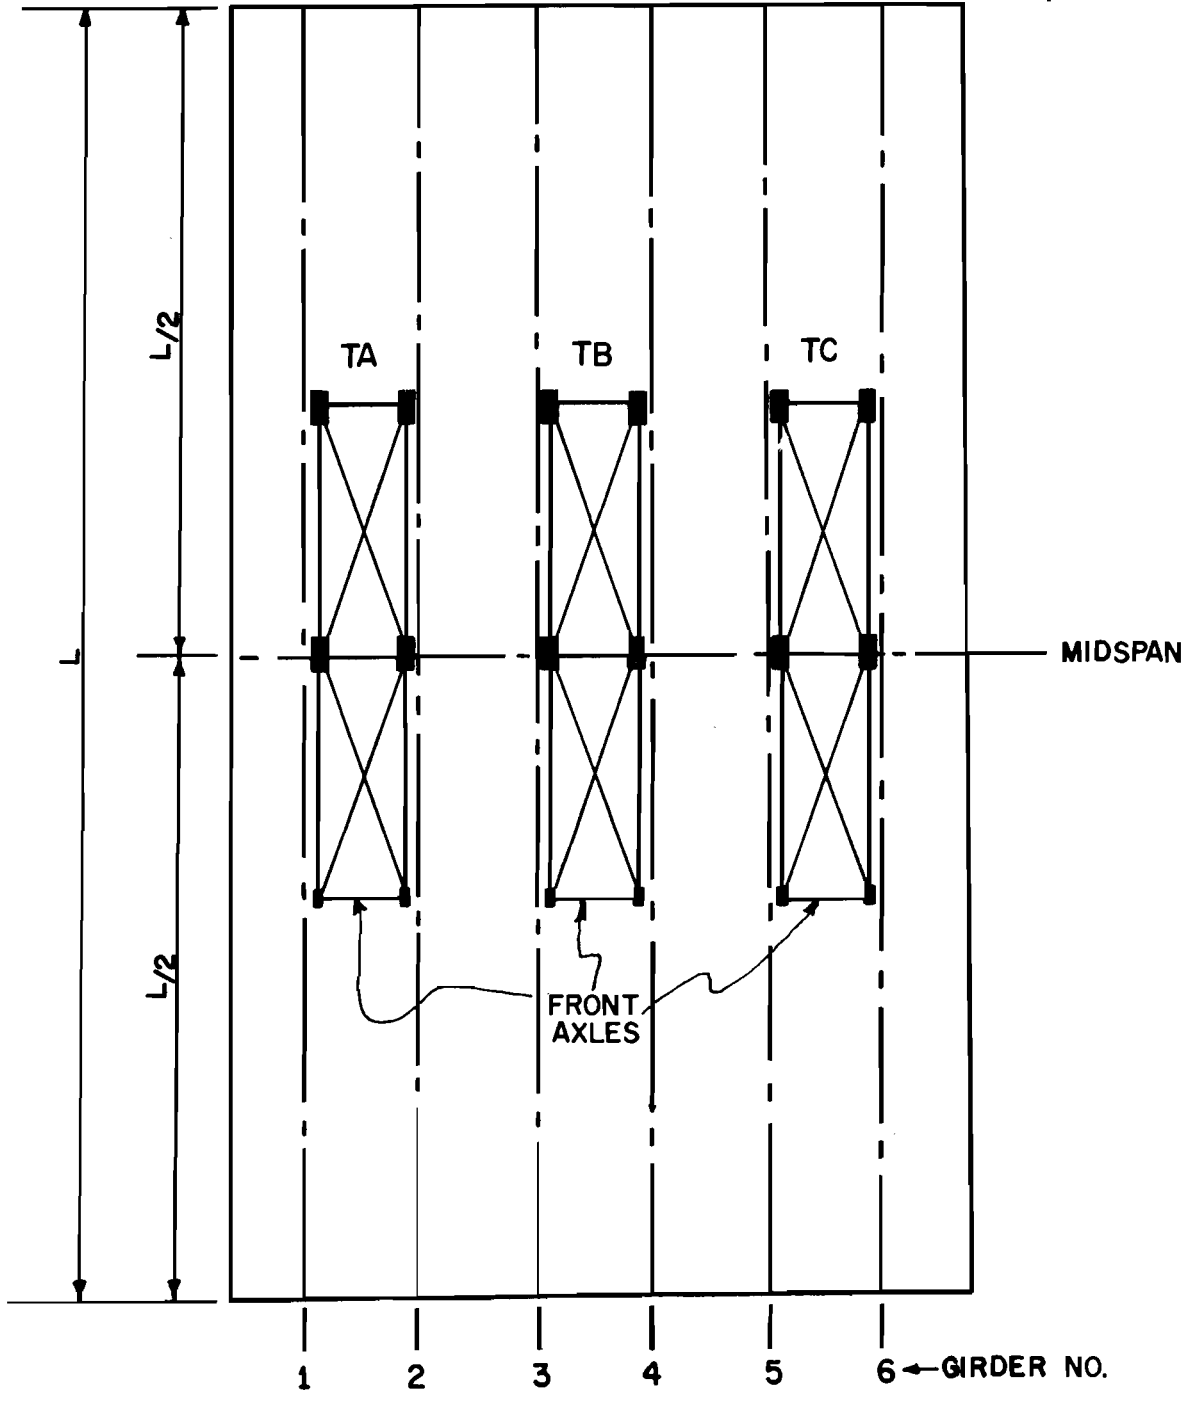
Truck load locations, Bridge 3 and Bridge 4.
